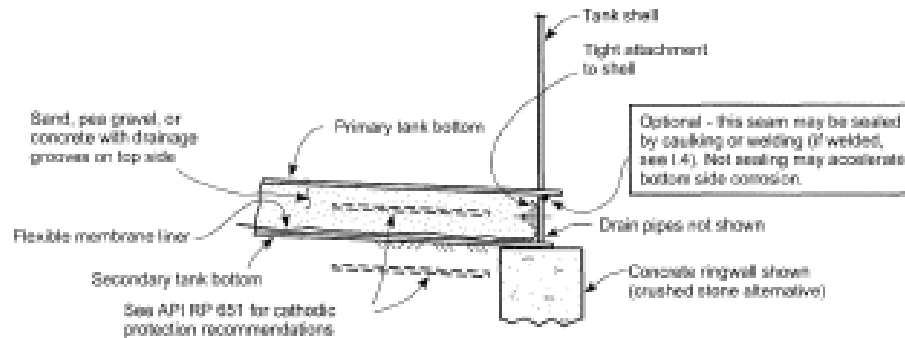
Double Steel Bottom with Leak Detection at the Tank Perimeter (Typical Arrangement)
